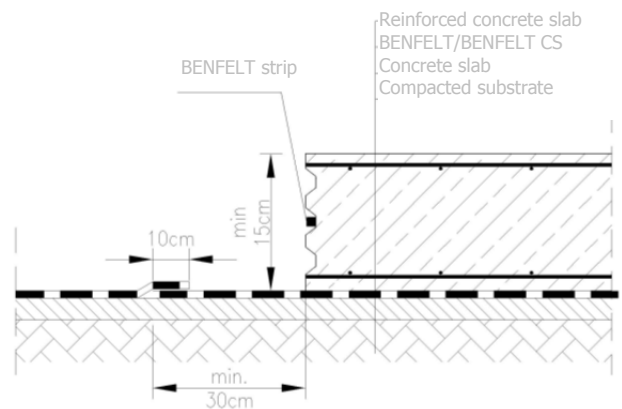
Construction joint in concrete works of the foundation board - on layer of thickened concrete pad.
